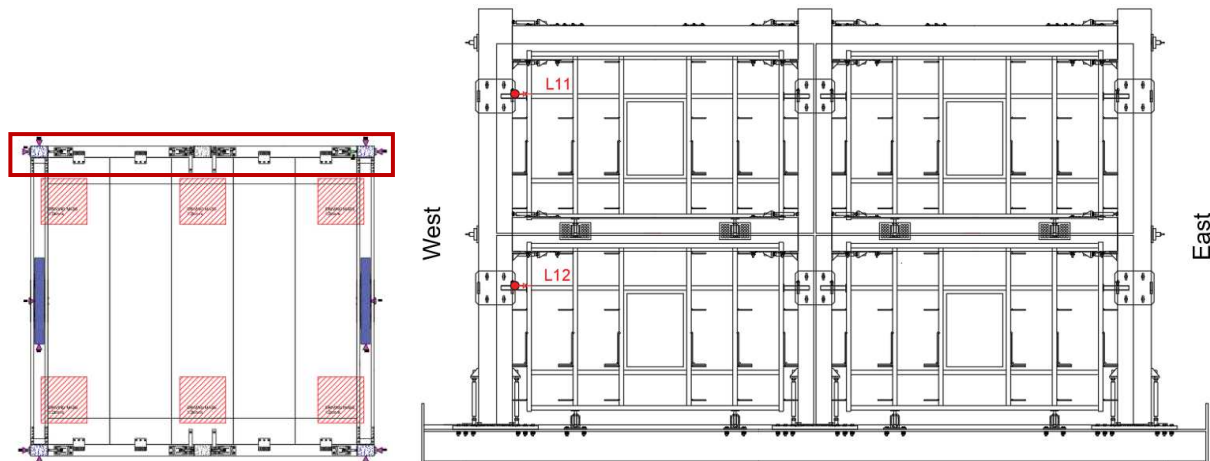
Instrumentation plan for the GFRG façade in the South side: schematic drawing.
